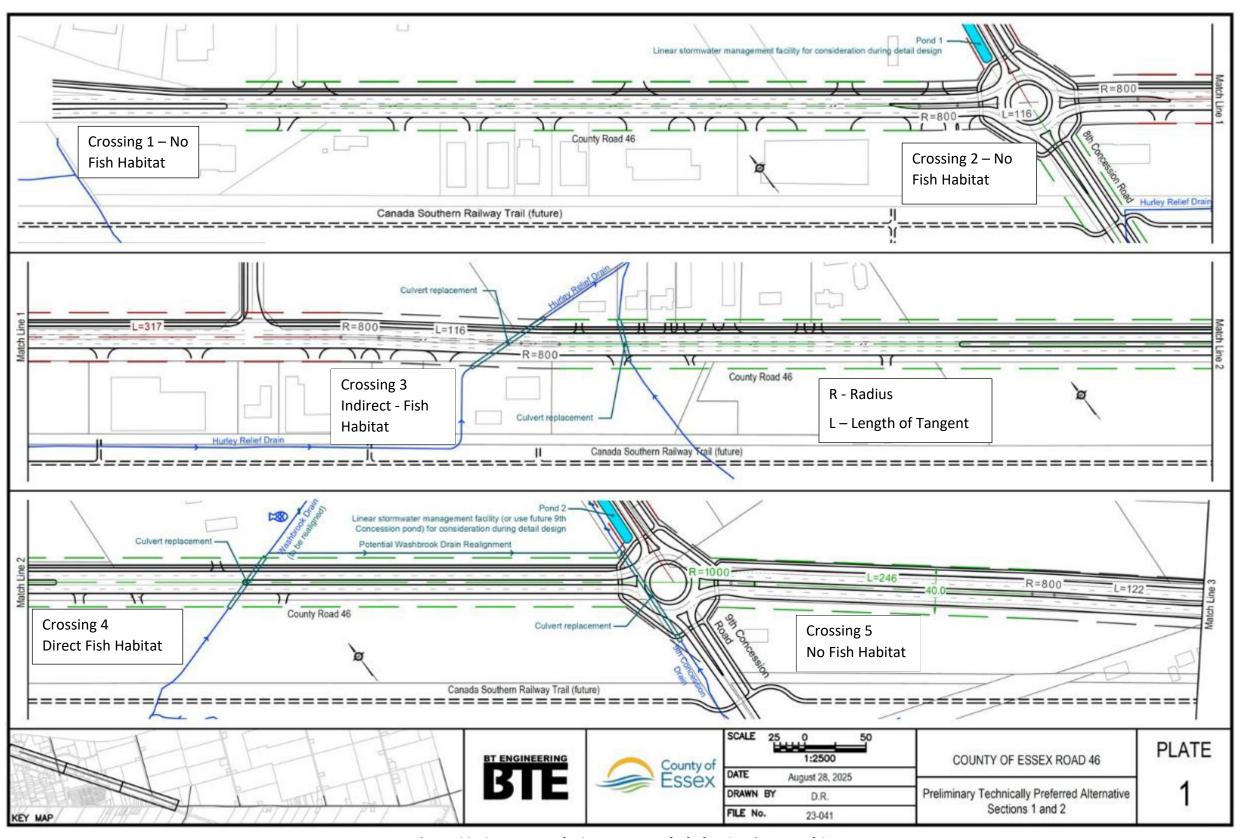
County Road 46 Recommended Plan Section 1 and 2
